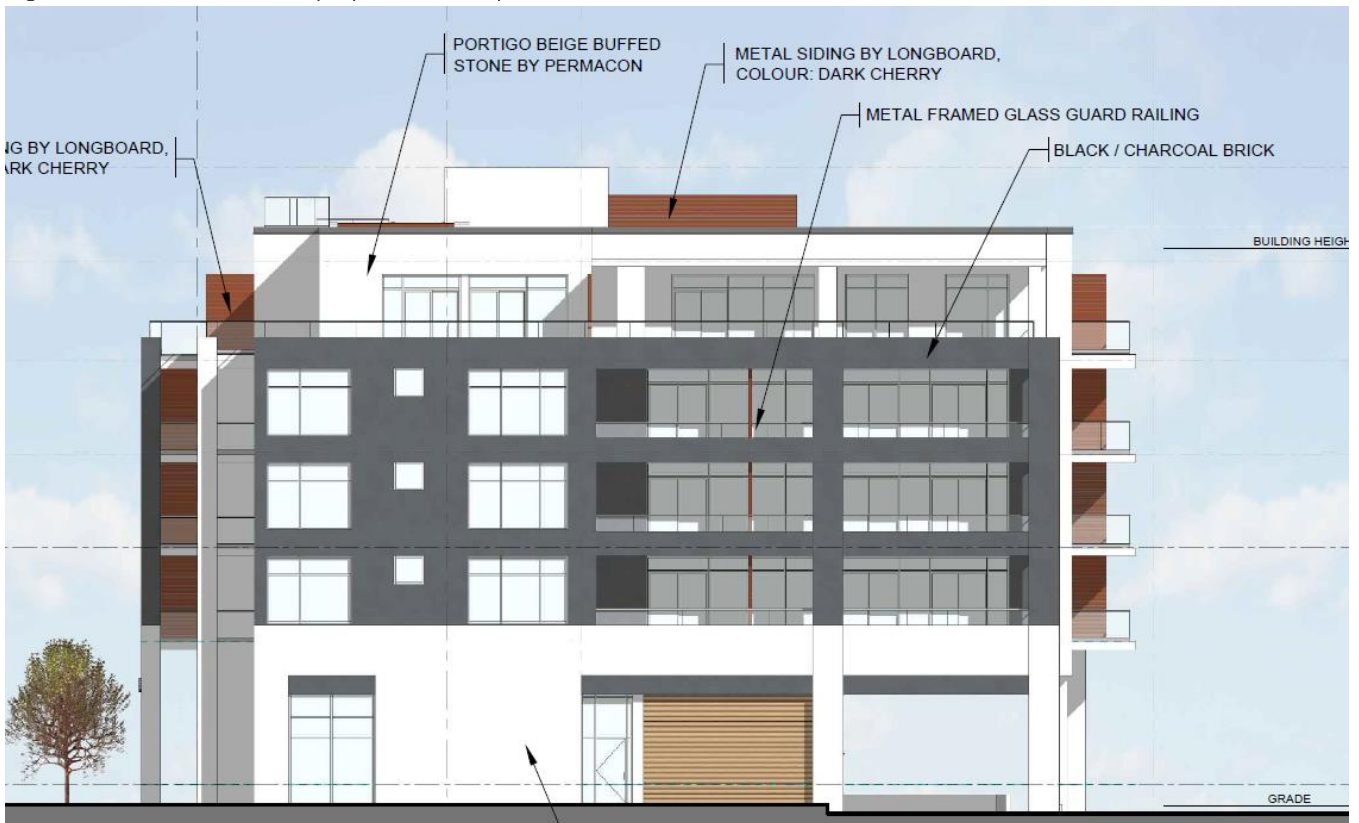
South elevation of proposed development (view from Springhurst Ave)
